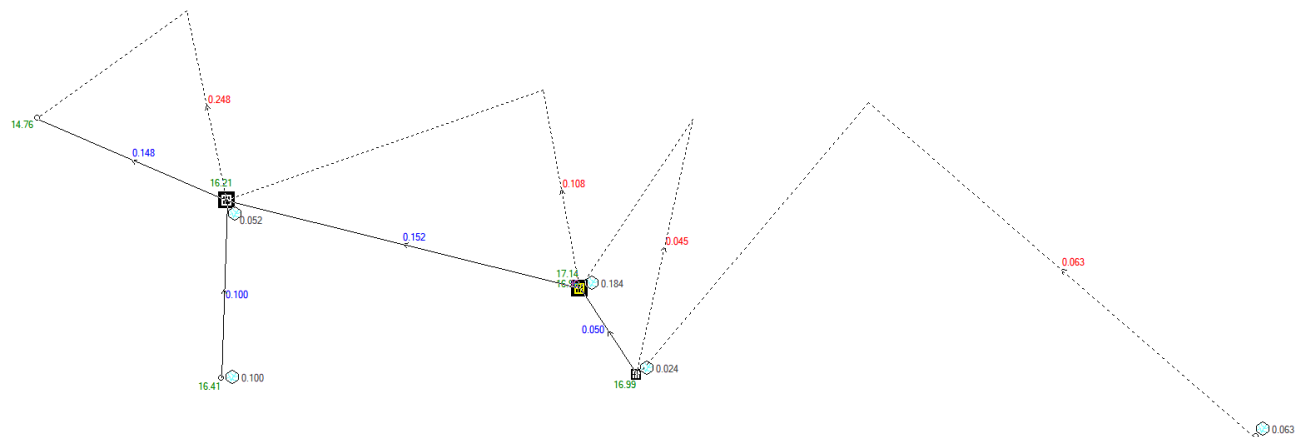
Existing Drainage Layout Thomas St in DRAINS
